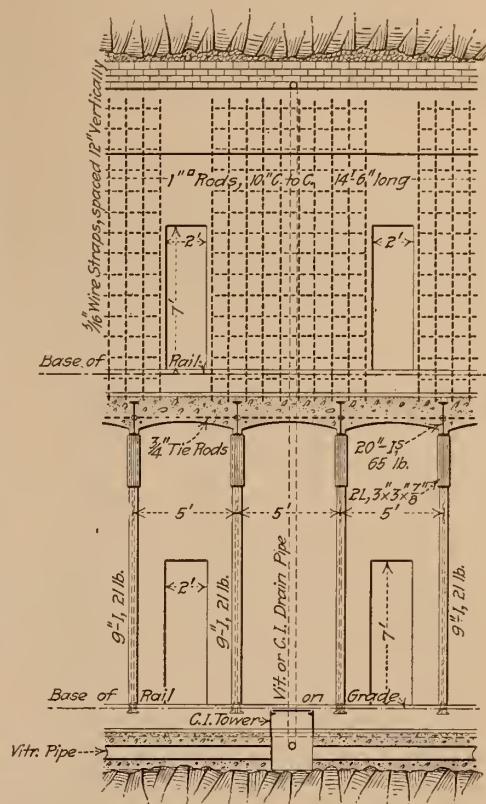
DOUBLE-DECK SUBWAY ON LEXINGTON AVENUE BUILT WHOLLY IN TUNNEL
